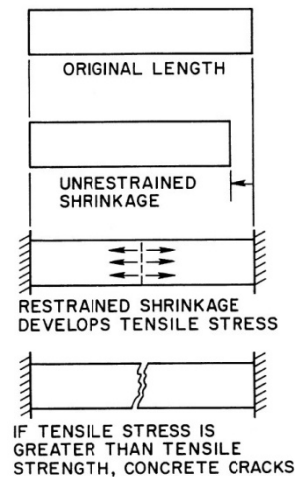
Cracking of concrete due to drying shrinkage and restraint (ACI 2001).
